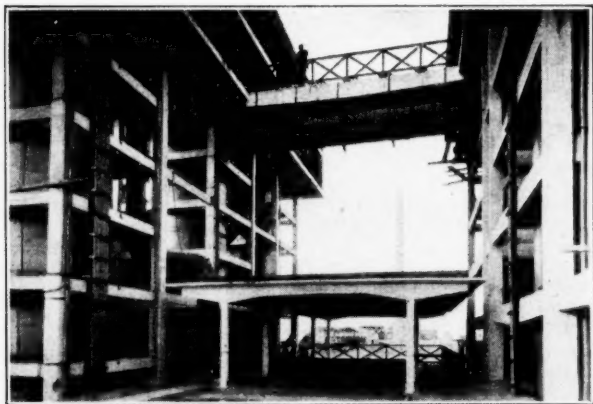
SAN CARLOS PLANT SHOWING REINFORCED CONCRETE SKELETON STRUCTURE.
